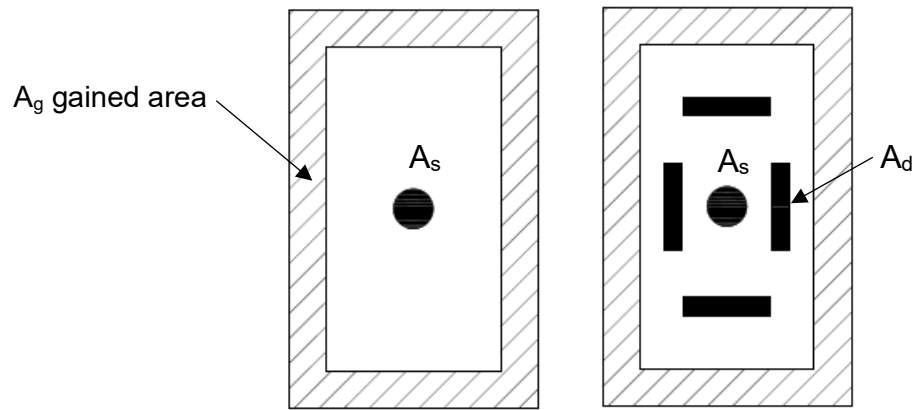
Addition of area (A_g) with a subsequent loss in section due to damage (A_d)
